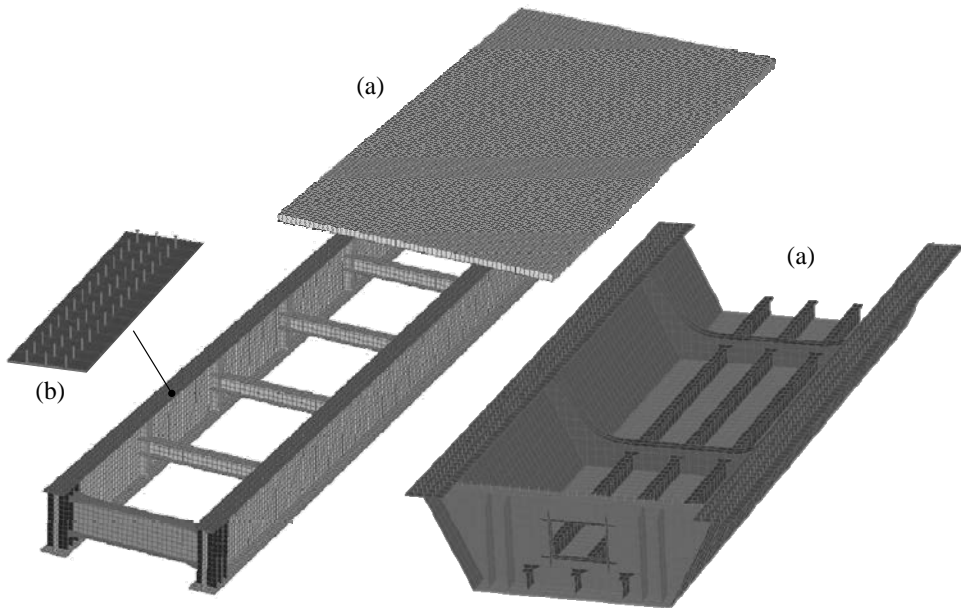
3D finite element model of the bridge deck: (a) overall view, (b) detail of the studs modelling.
